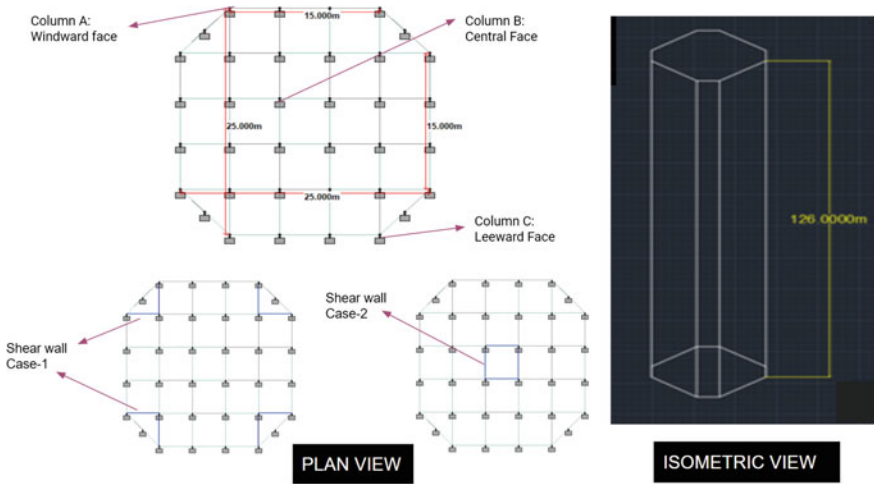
Plan view of building, shear wall case-1, shear wall case-2, and isometric view of square-shaped building with recessed corners
